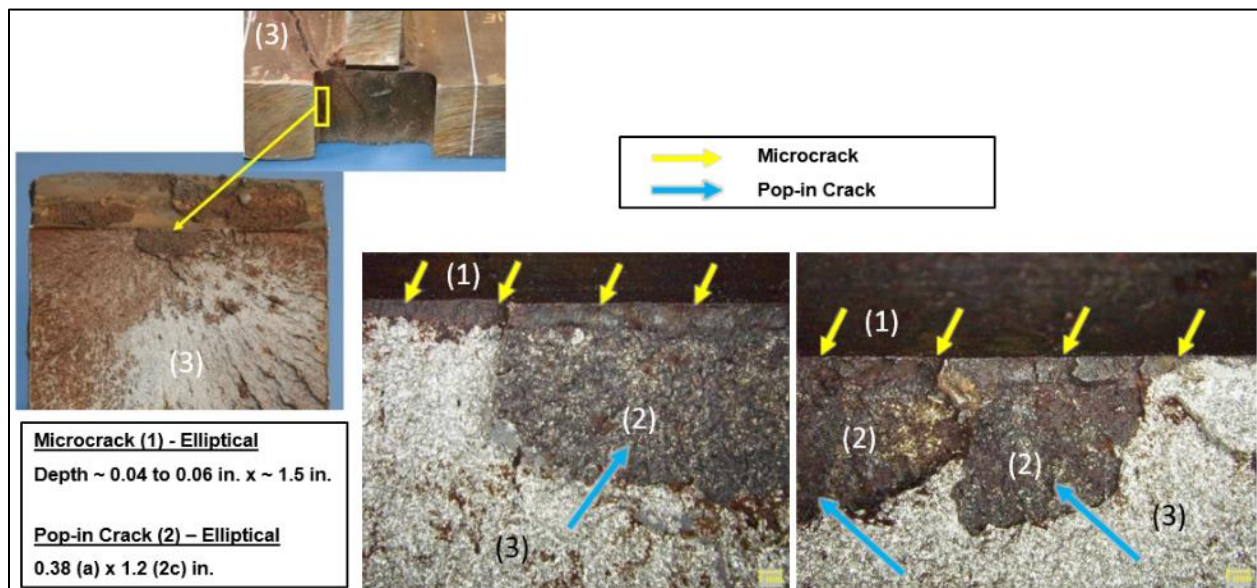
Fremont Street D.4 girder fracture features: (1) microcracks, (2) pop-in crack, and (3) bottom flange fracture.
